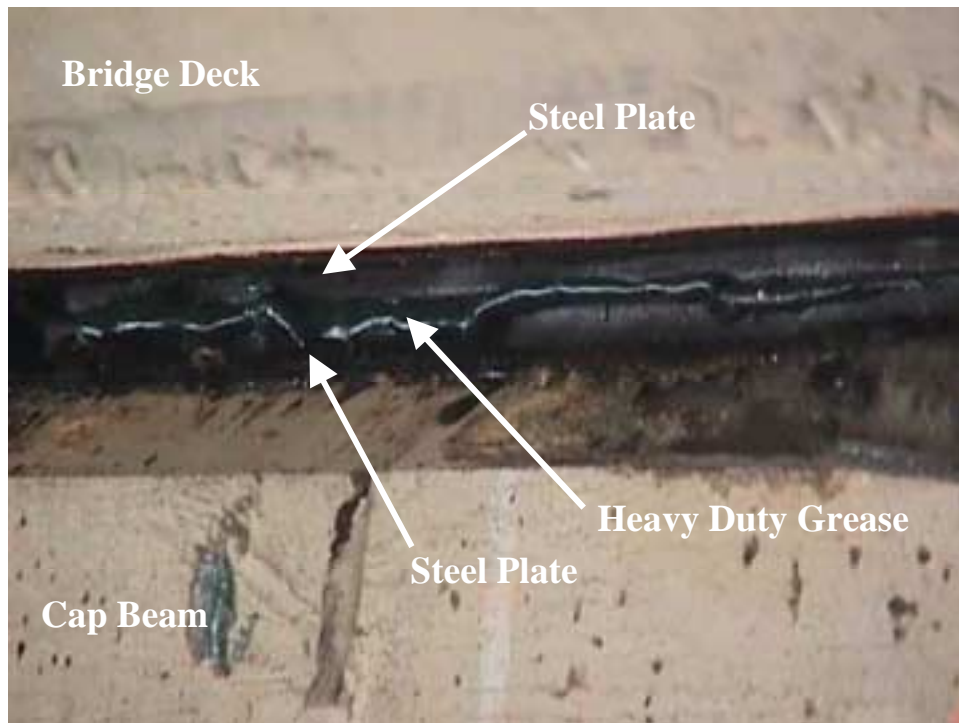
Steel plates assembly to reduce deck/cap beam friction.
